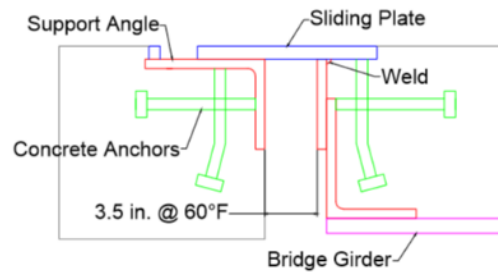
Cross-section of typical MoDOT finger plate expansion device
